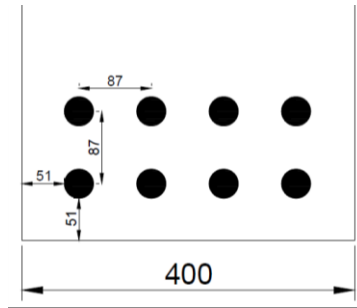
Bottom reinforcement of the girders of the studied bridge (dimensions in mm)
